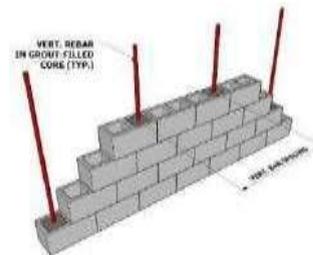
Vertical reinforcement in masonry walls (<http://www.arch.ttu.edu/>)
